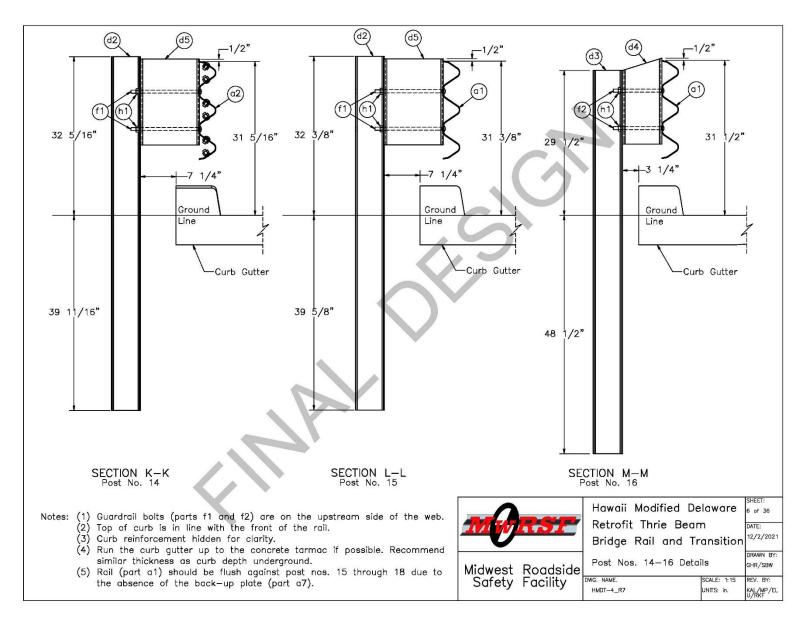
Post Nos. 14 through 16 Details, Test No. HMDT-4
